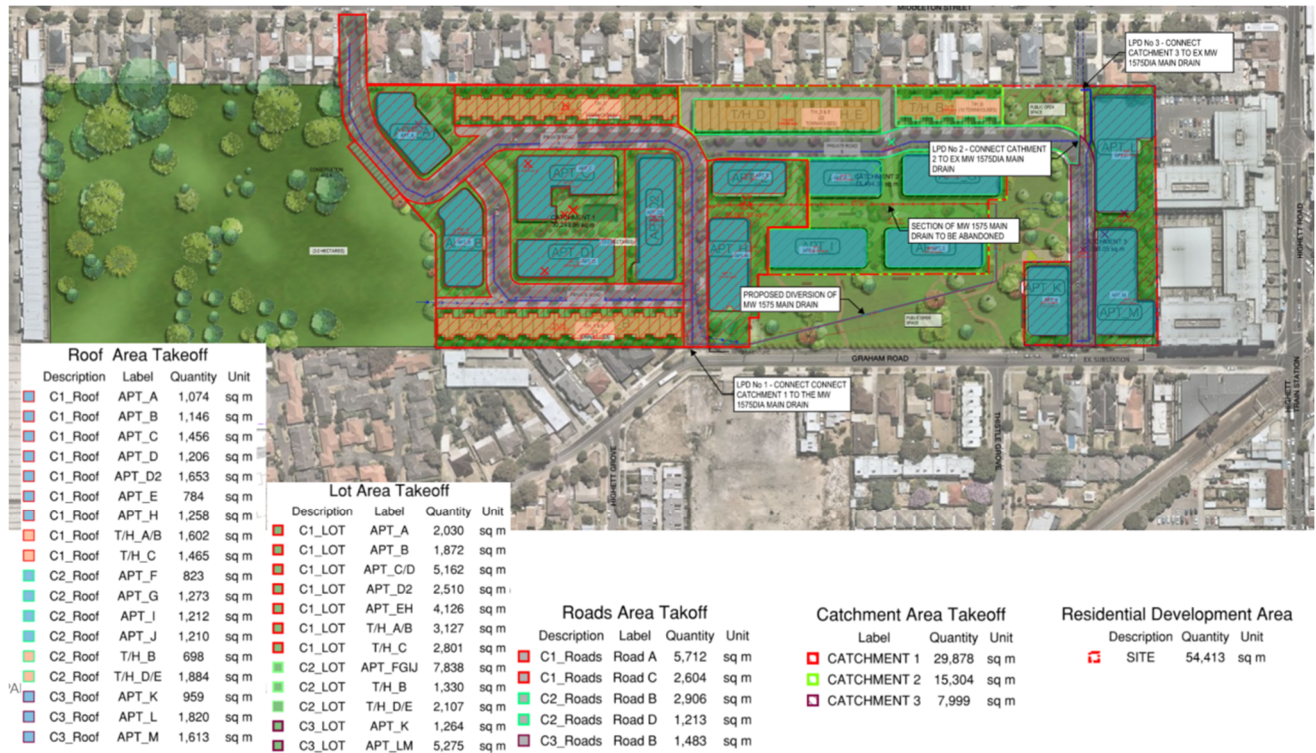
Stormwater Detailed Catchment Plan and Areas Take-off
